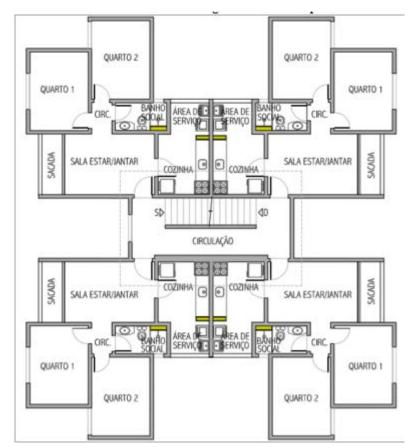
Architectural plan of block H. Source: Author's Collection, 2019.
